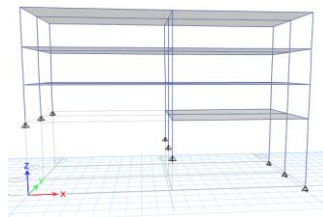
(b): 3-D view 15<sup>0</sup> inclination
